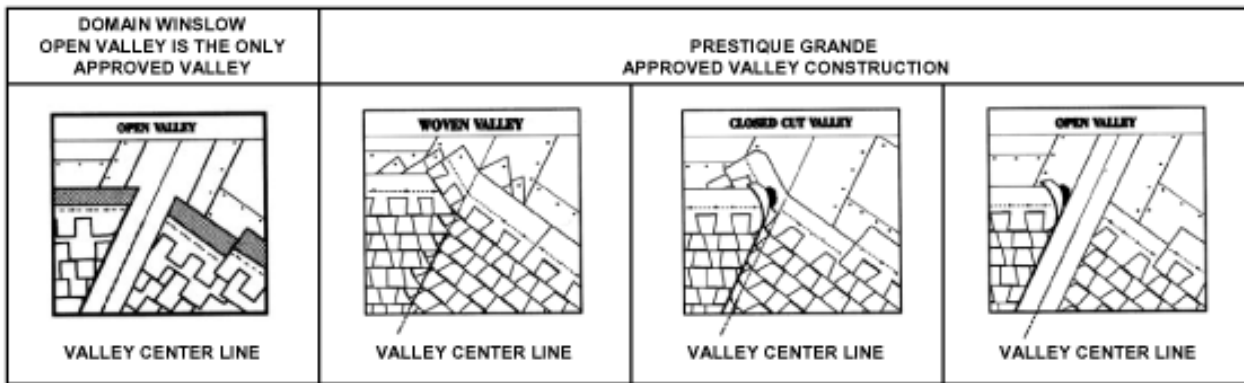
TYPICAL VALLEY INSTALLATION DETAILS
